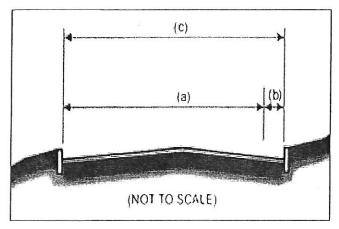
Cross-Section Profile -- Curbed Residential Access Street
